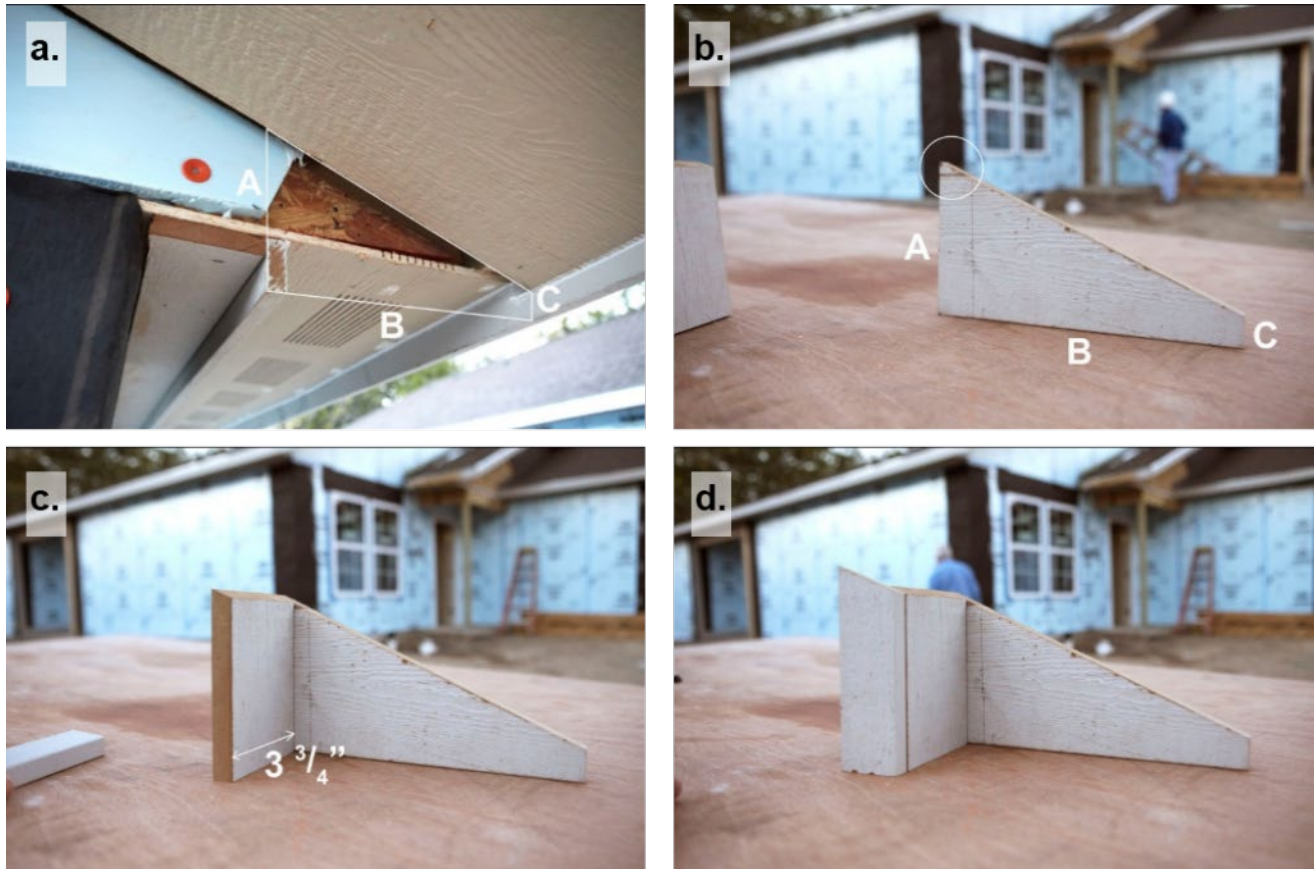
Assembly of Bird Box (Brick-to-Brick Transition), Option 1
